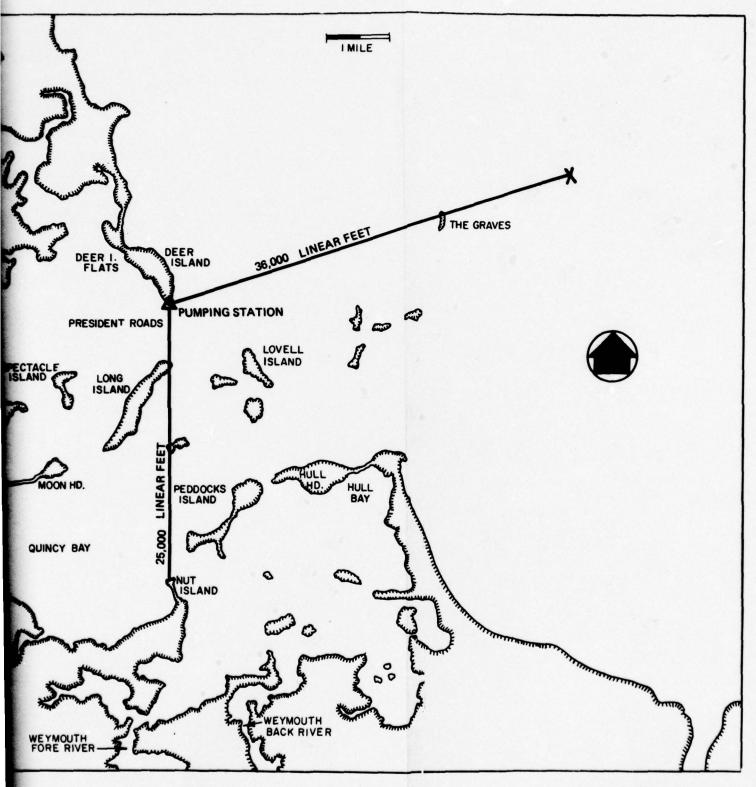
OCEAN OUTFALL DISCHARGE PLAN
